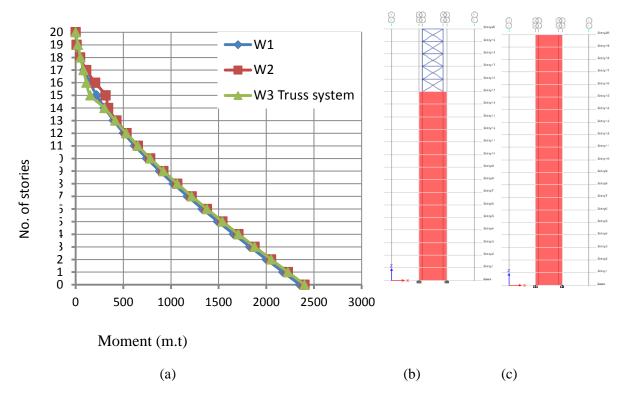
(a) Represents the comparison of bending moment results between W1, W2 and W3(b) Elevation of W3 shear wall modified to truss system at 15<sup>th</sup> floor- (c) Elevation of shear wall W1 for model 1 and W2 for model (1-a).
